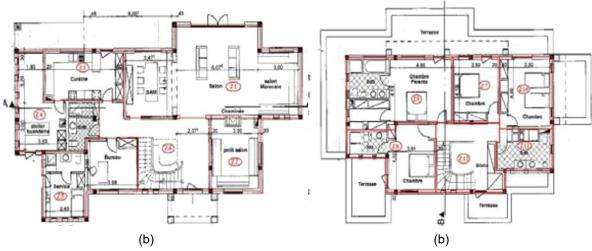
Dar Amys plan view: (a) 1st floor level and (b) second floor level [2]
